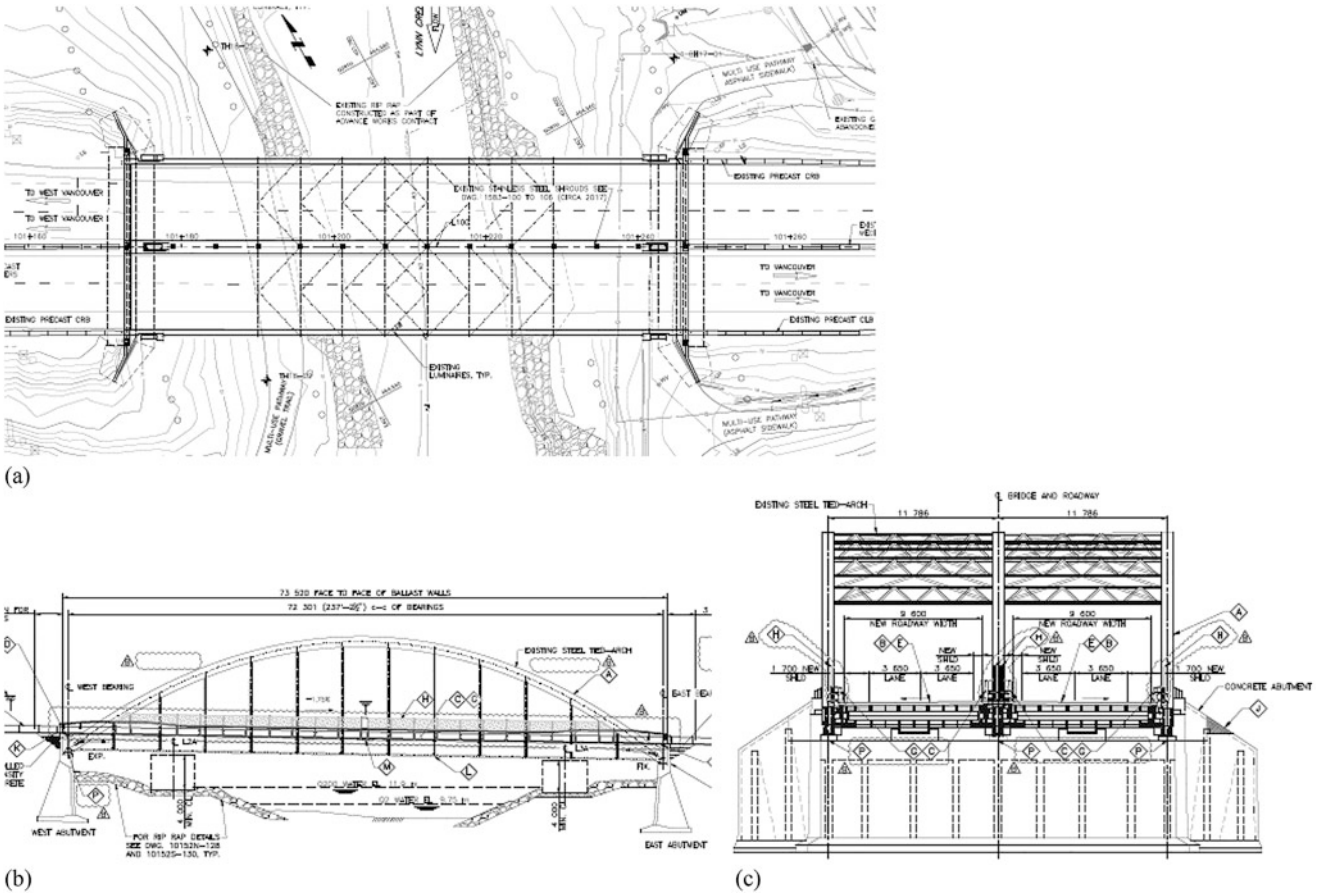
Sectional views of the bridge: (a) plan view; (b) south elevation; and (c) cross-section of the bridge [1]
